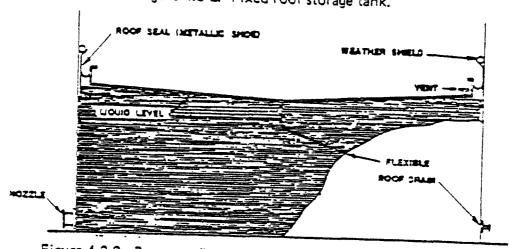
Pan-type floating roof storage tank (metallic seals).
